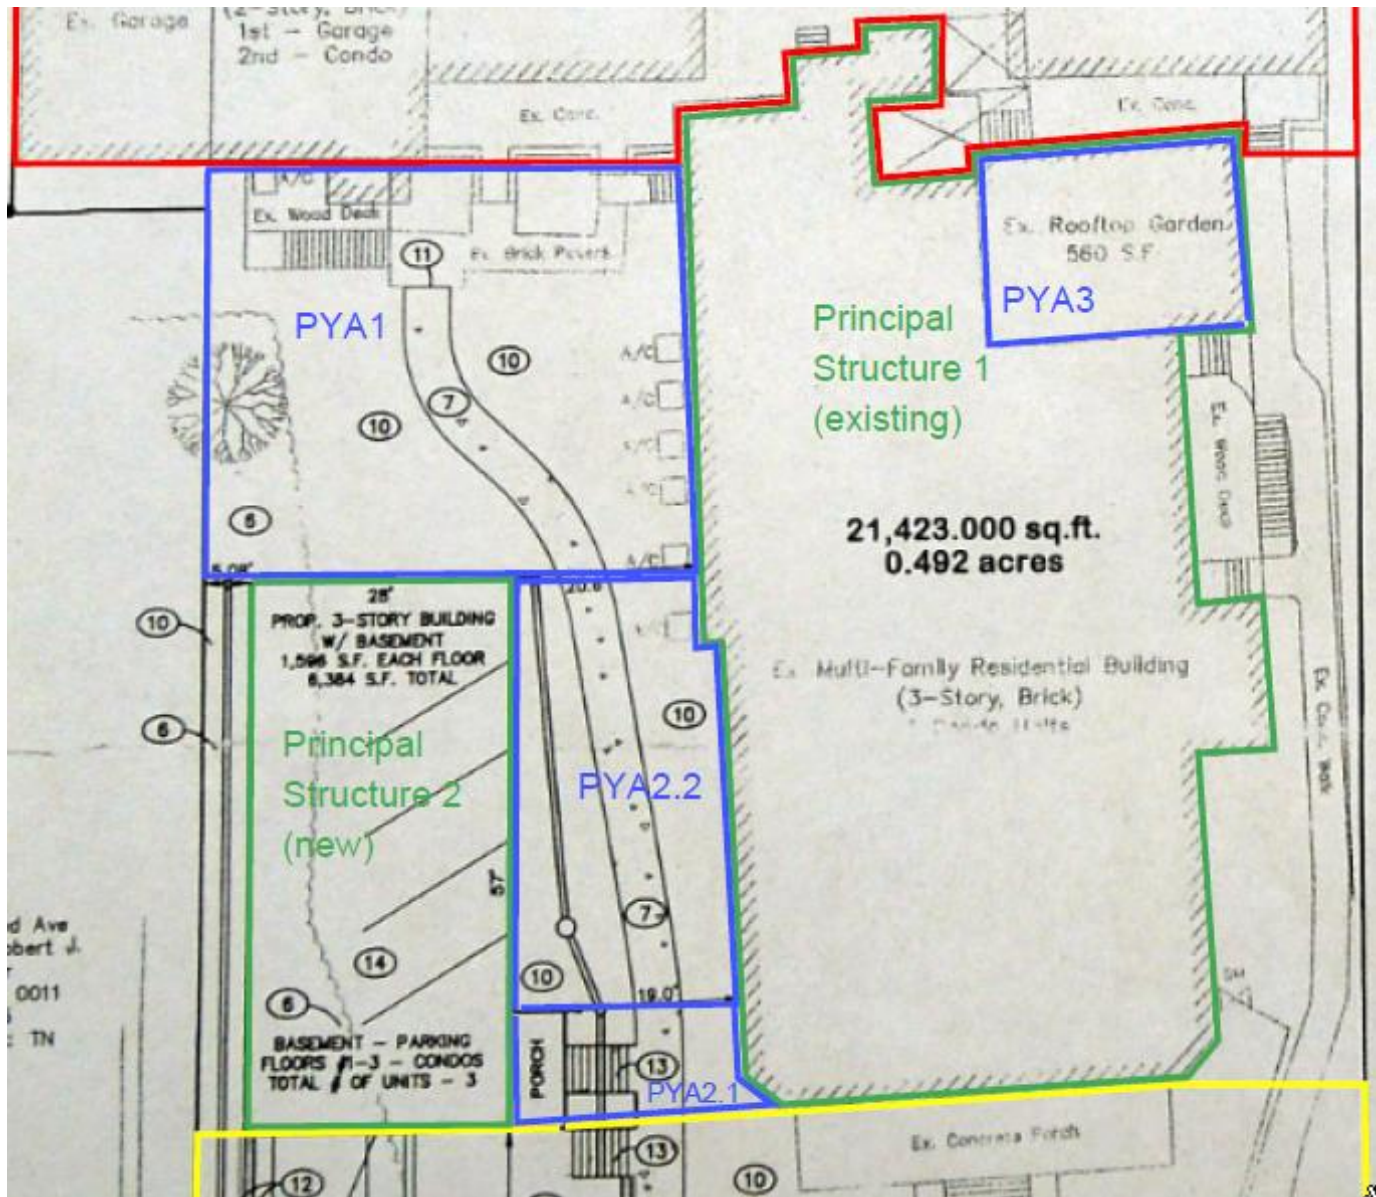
(Based on excerpt of 2013 building permit application document C3 – Site Layout Plan)
